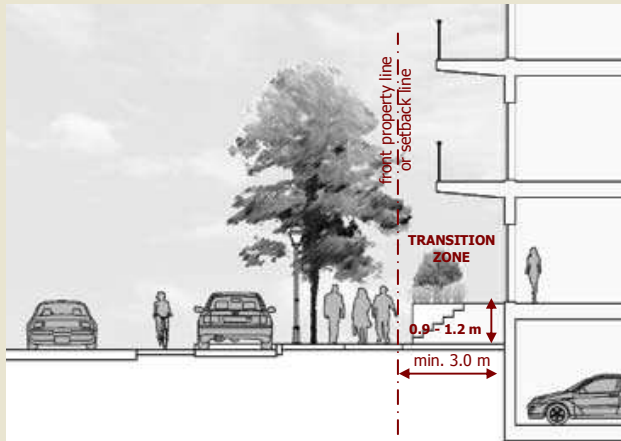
Approach I: Residential uses are elevated above the ground floor, but directly linked to the public sidewalk through individual points of access serving each unit.
